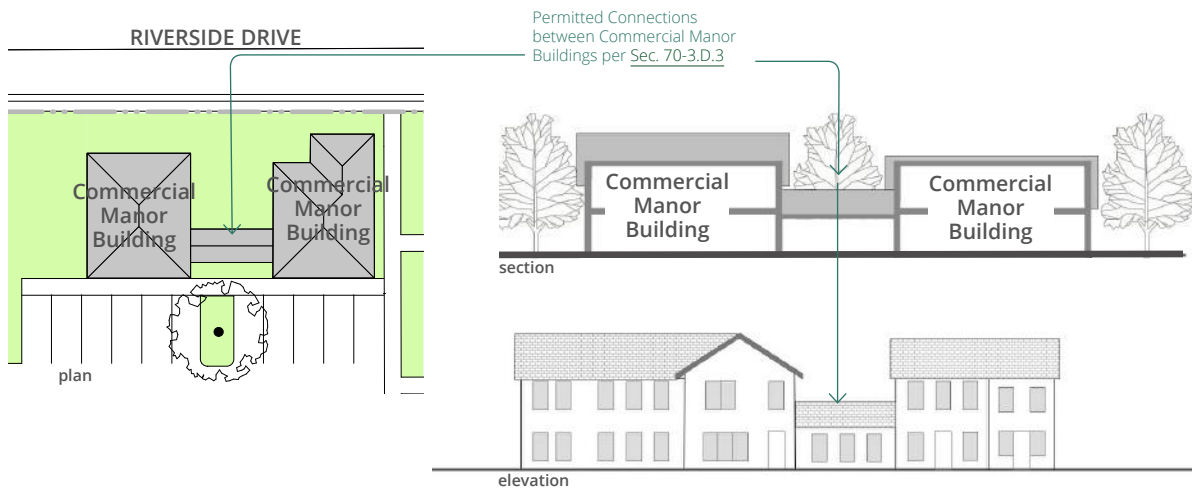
D-5. Commercial Manor Building: Connections
